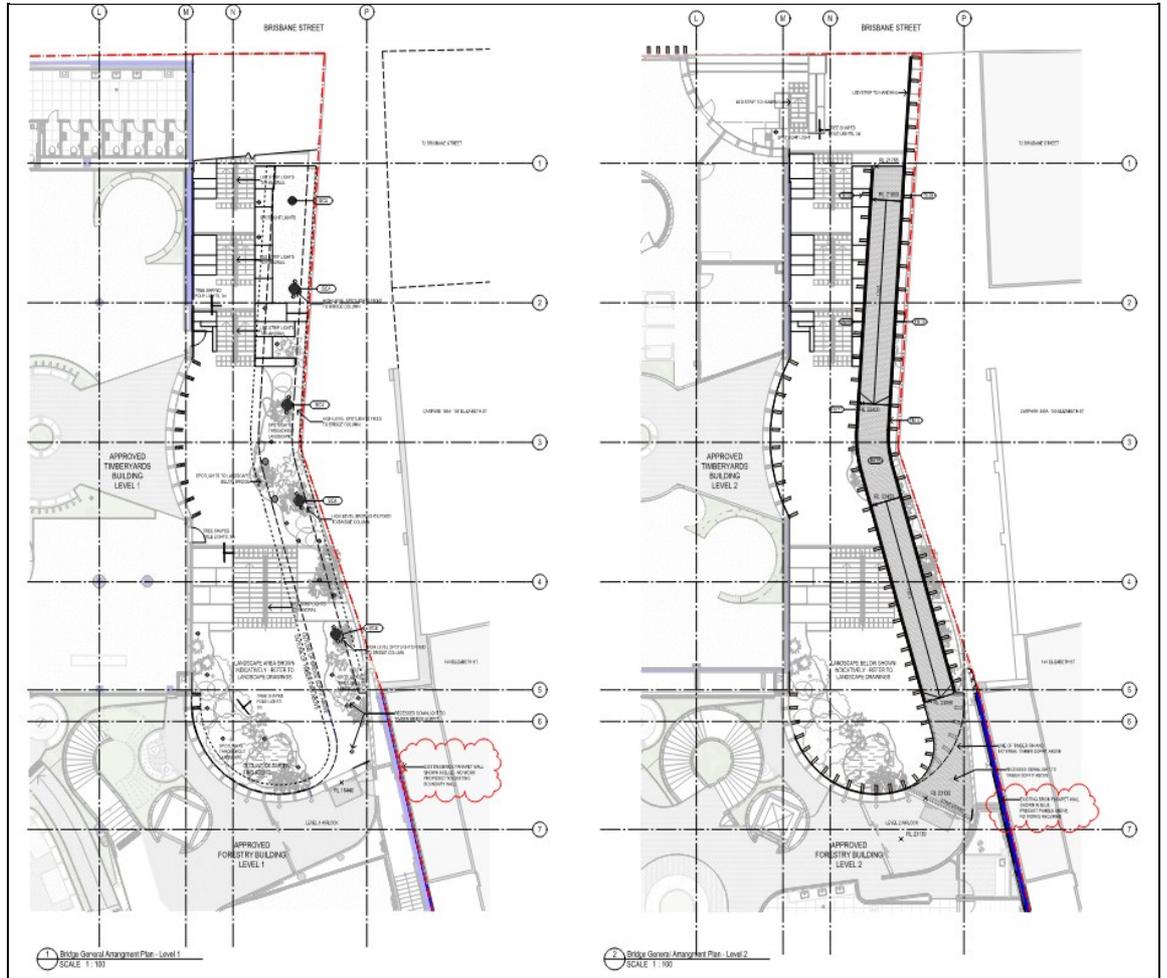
Ground and upper floor plan of laneway and proposed pedestrian bridge.
